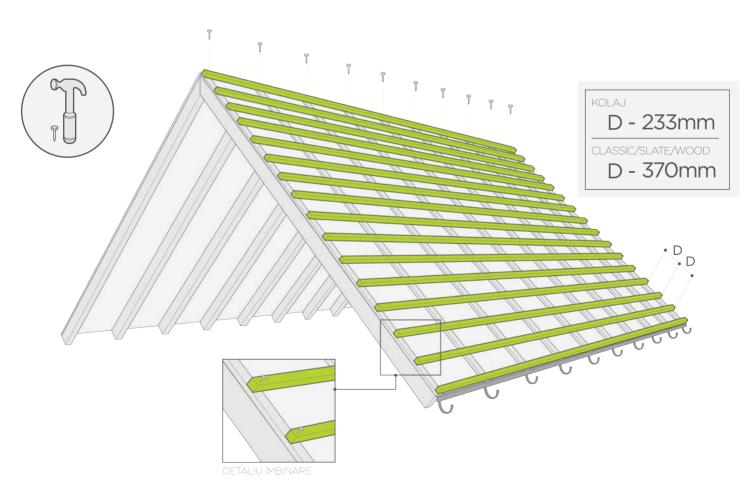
INSTALLING OF THE HORIZONTAL BATTENS - BOUND DETAIL
